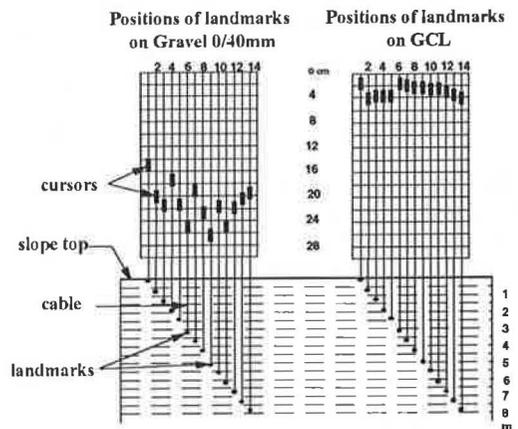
Instrumentation of the lining system of the GCL landfill cell. Slope 1/2.
